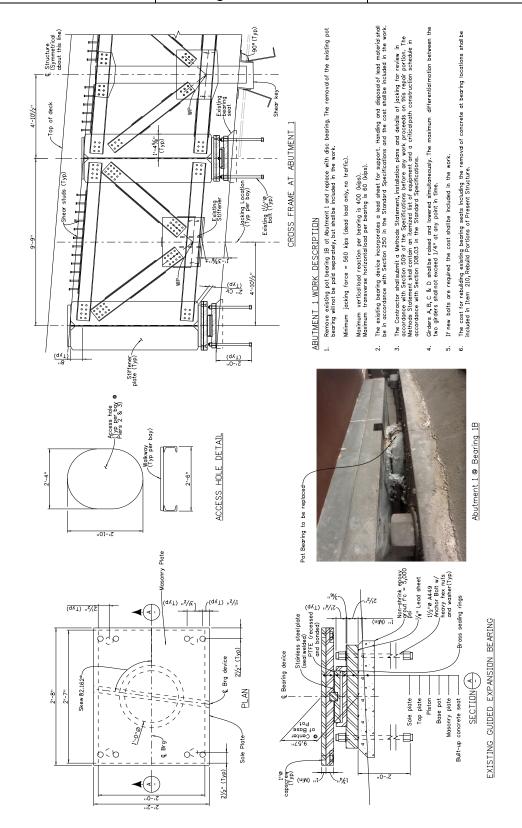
(M)-1 Sample Details for Pot Bearing replacement
